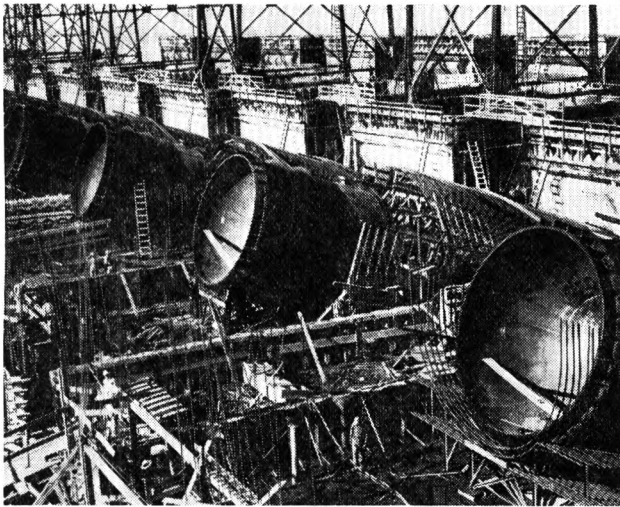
UPSTREAM SECTIONS OF 18-FT-DIAM PENSTOCKS IN PLACE IN DAM
